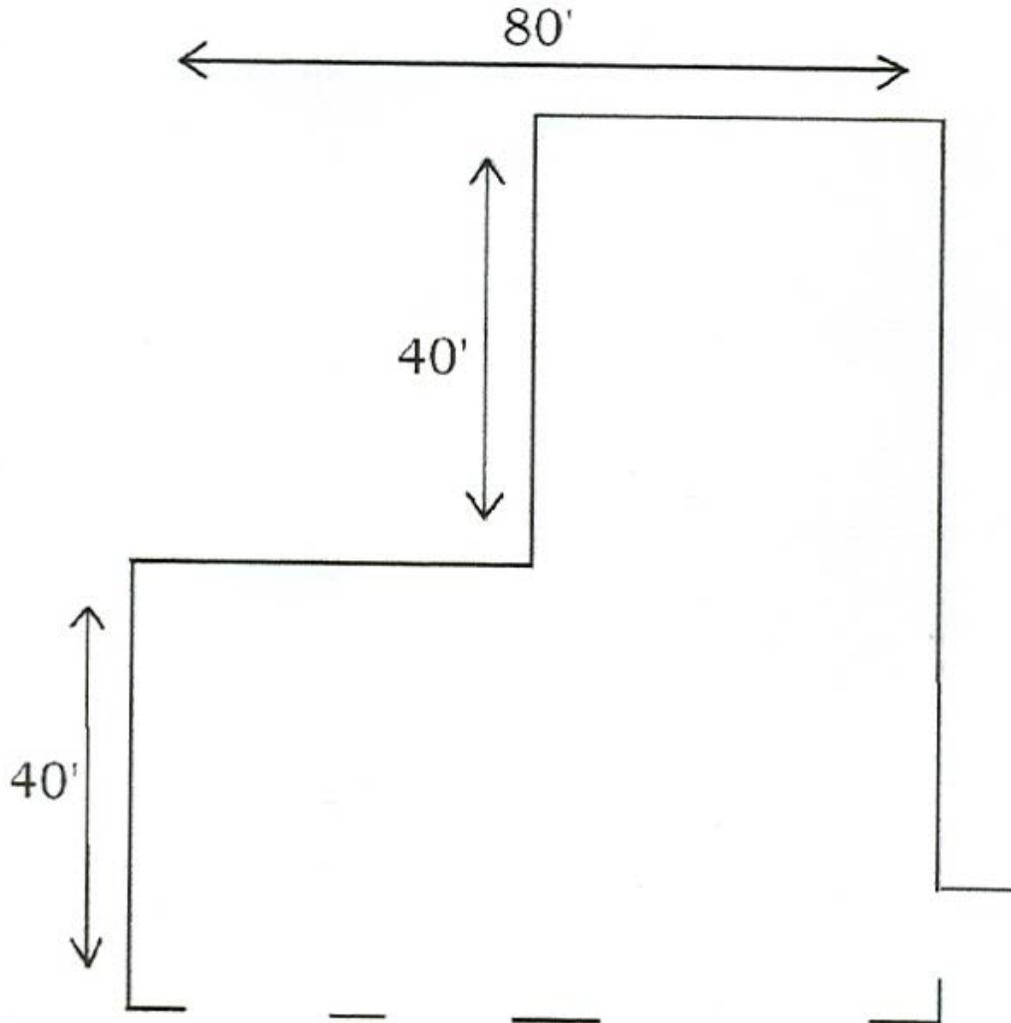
Vehicle Storage II (Building 13) Floor Plan
